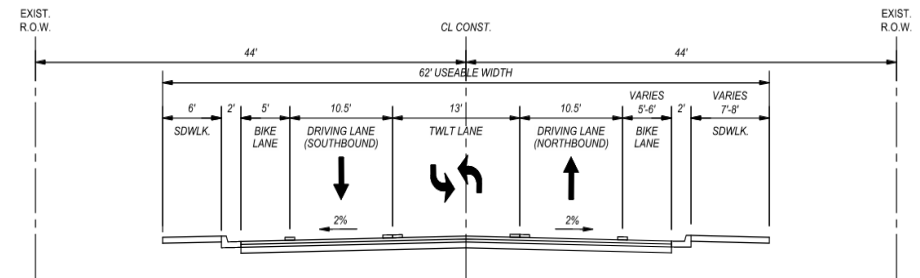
, Proposed Typical Sections from Siringo Road to James Street – Build Alternative 2
